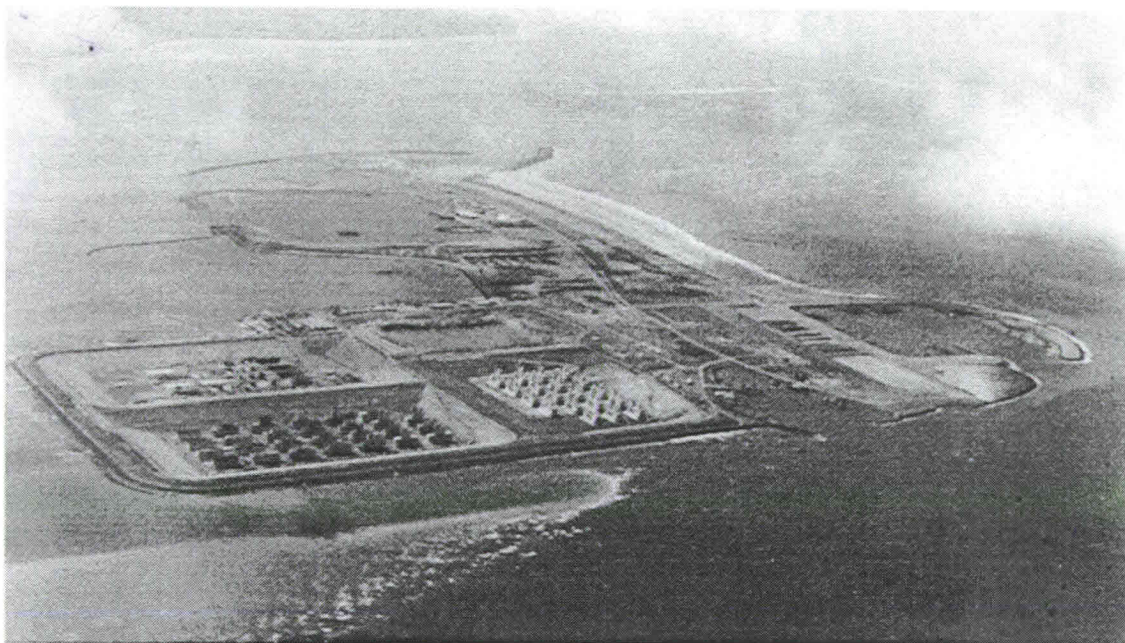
, Dredged Dock for Construction of Caissons at the Neeltje Jans Construction Island
